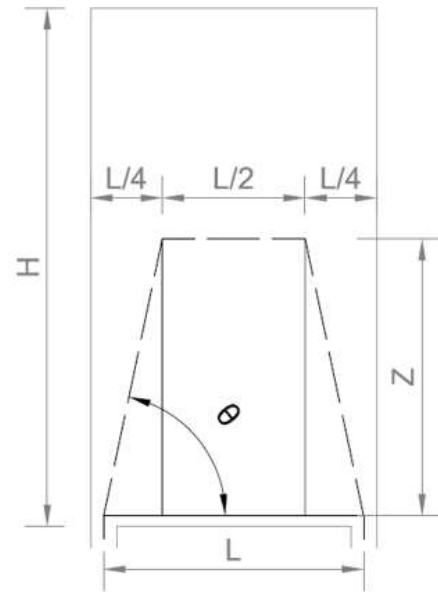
Model and dimensioning geometrical parameters for the deep beam with suspended load
